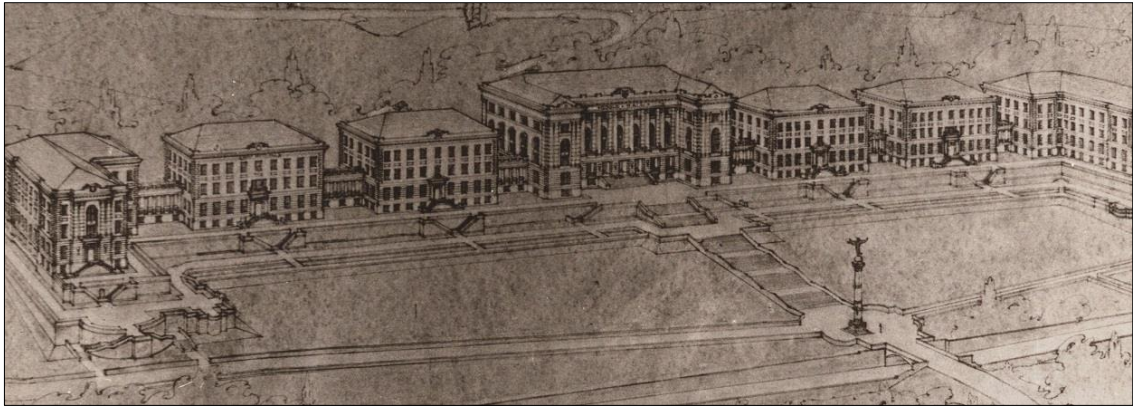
Original architectural plans depicting the layout of the seven buildings belonging to the American College for Girls. These plans were crafted by the esteemed Boston-based architectural firm, Shepley, Rutan & Coolidge Architecture. Source: CU-RBML, ACG document. Boğaziçi Archives Robert College Online Exhibition. <http://bogaziciarsivleri.boun.edu.tr/en/exhibition/robert.php>
